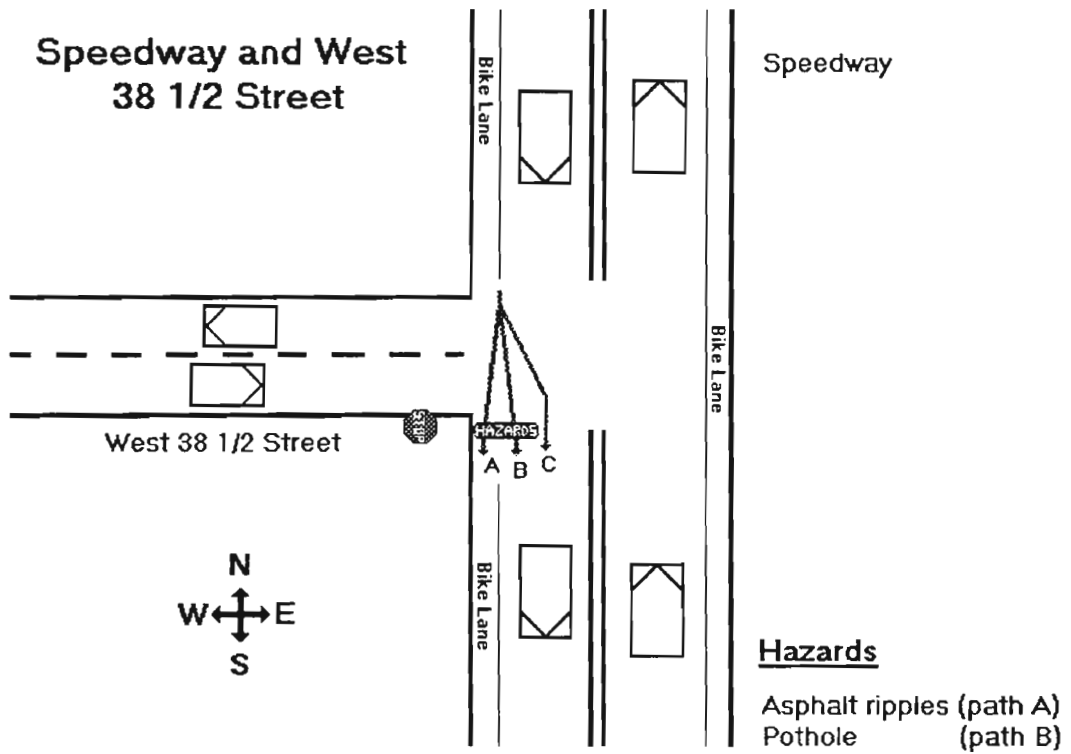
Diagram of Speedway and West 38-1/2 Street Intersection
